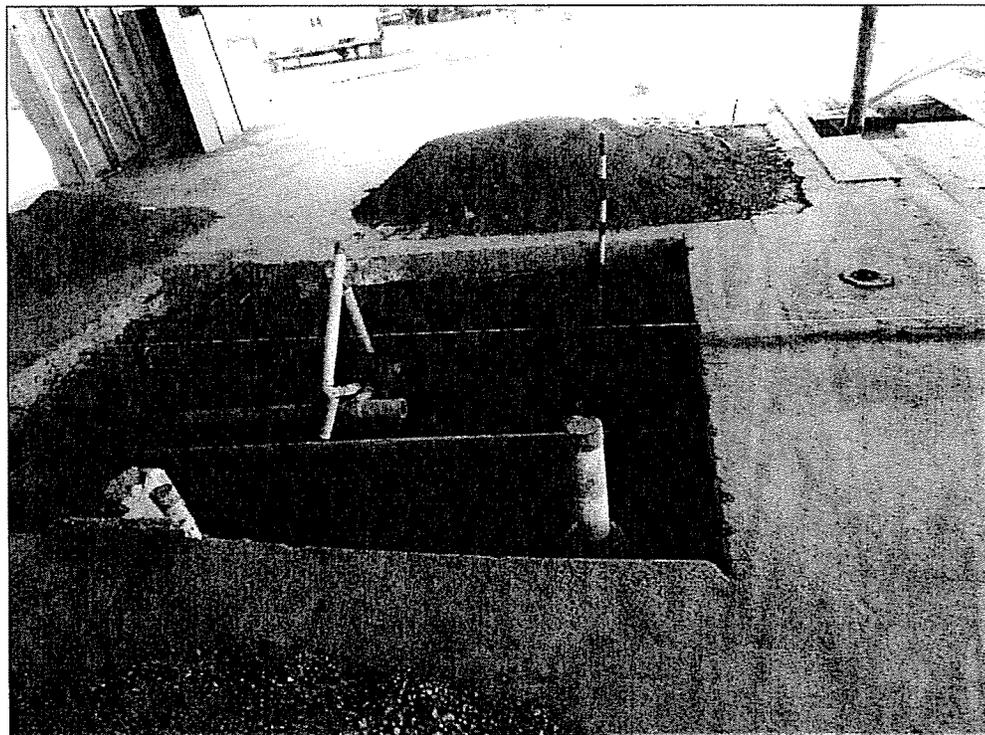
Excavated pit at north end of main house, view to the west, showing layer of fill material above gravel layer
